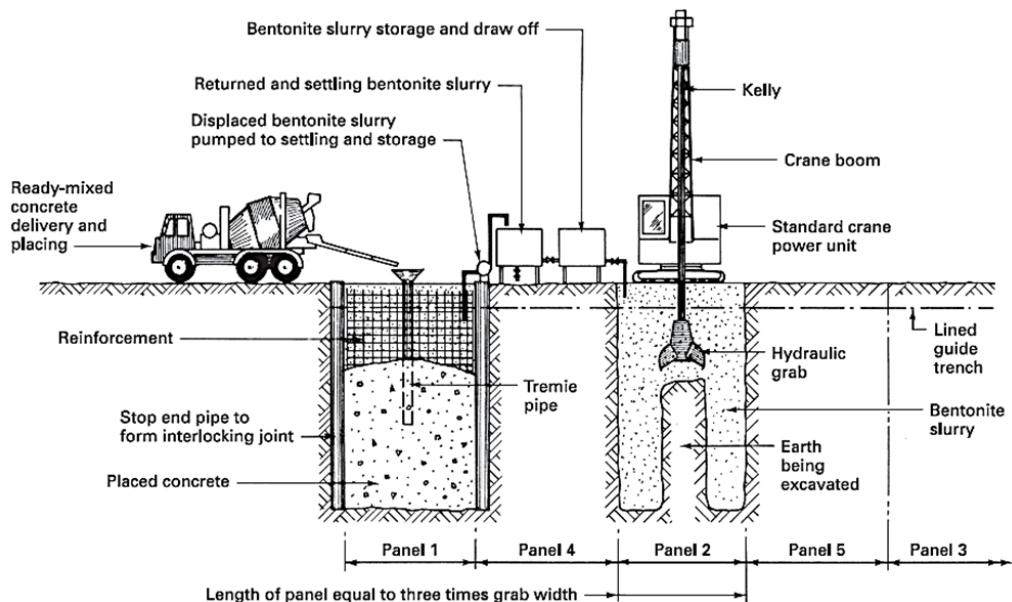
Diaphragm wall construction: bentonite slurry method
